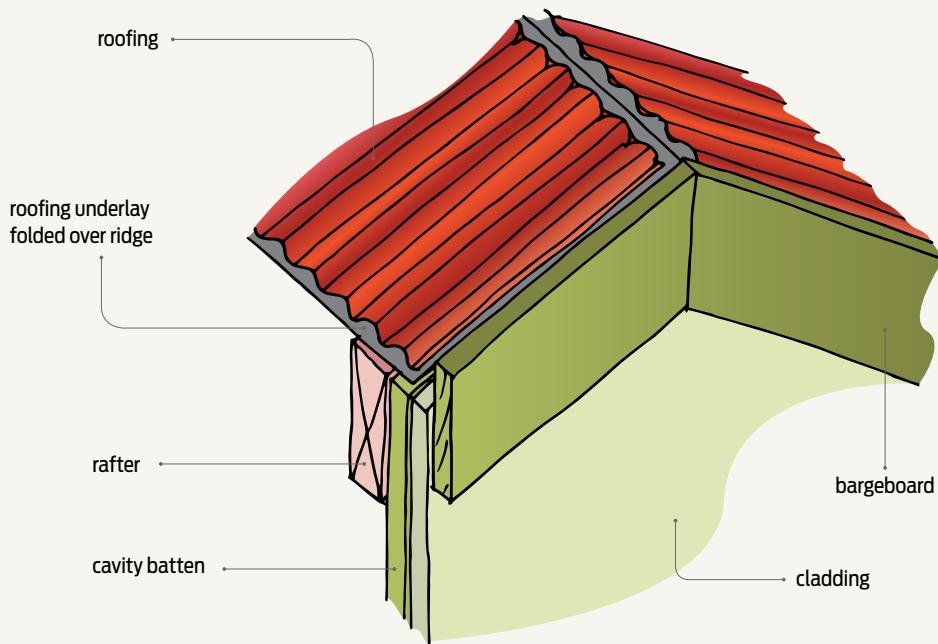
Intersection of the barge flashing and the ridge flashing to the gable end of a roof – Step 1.
